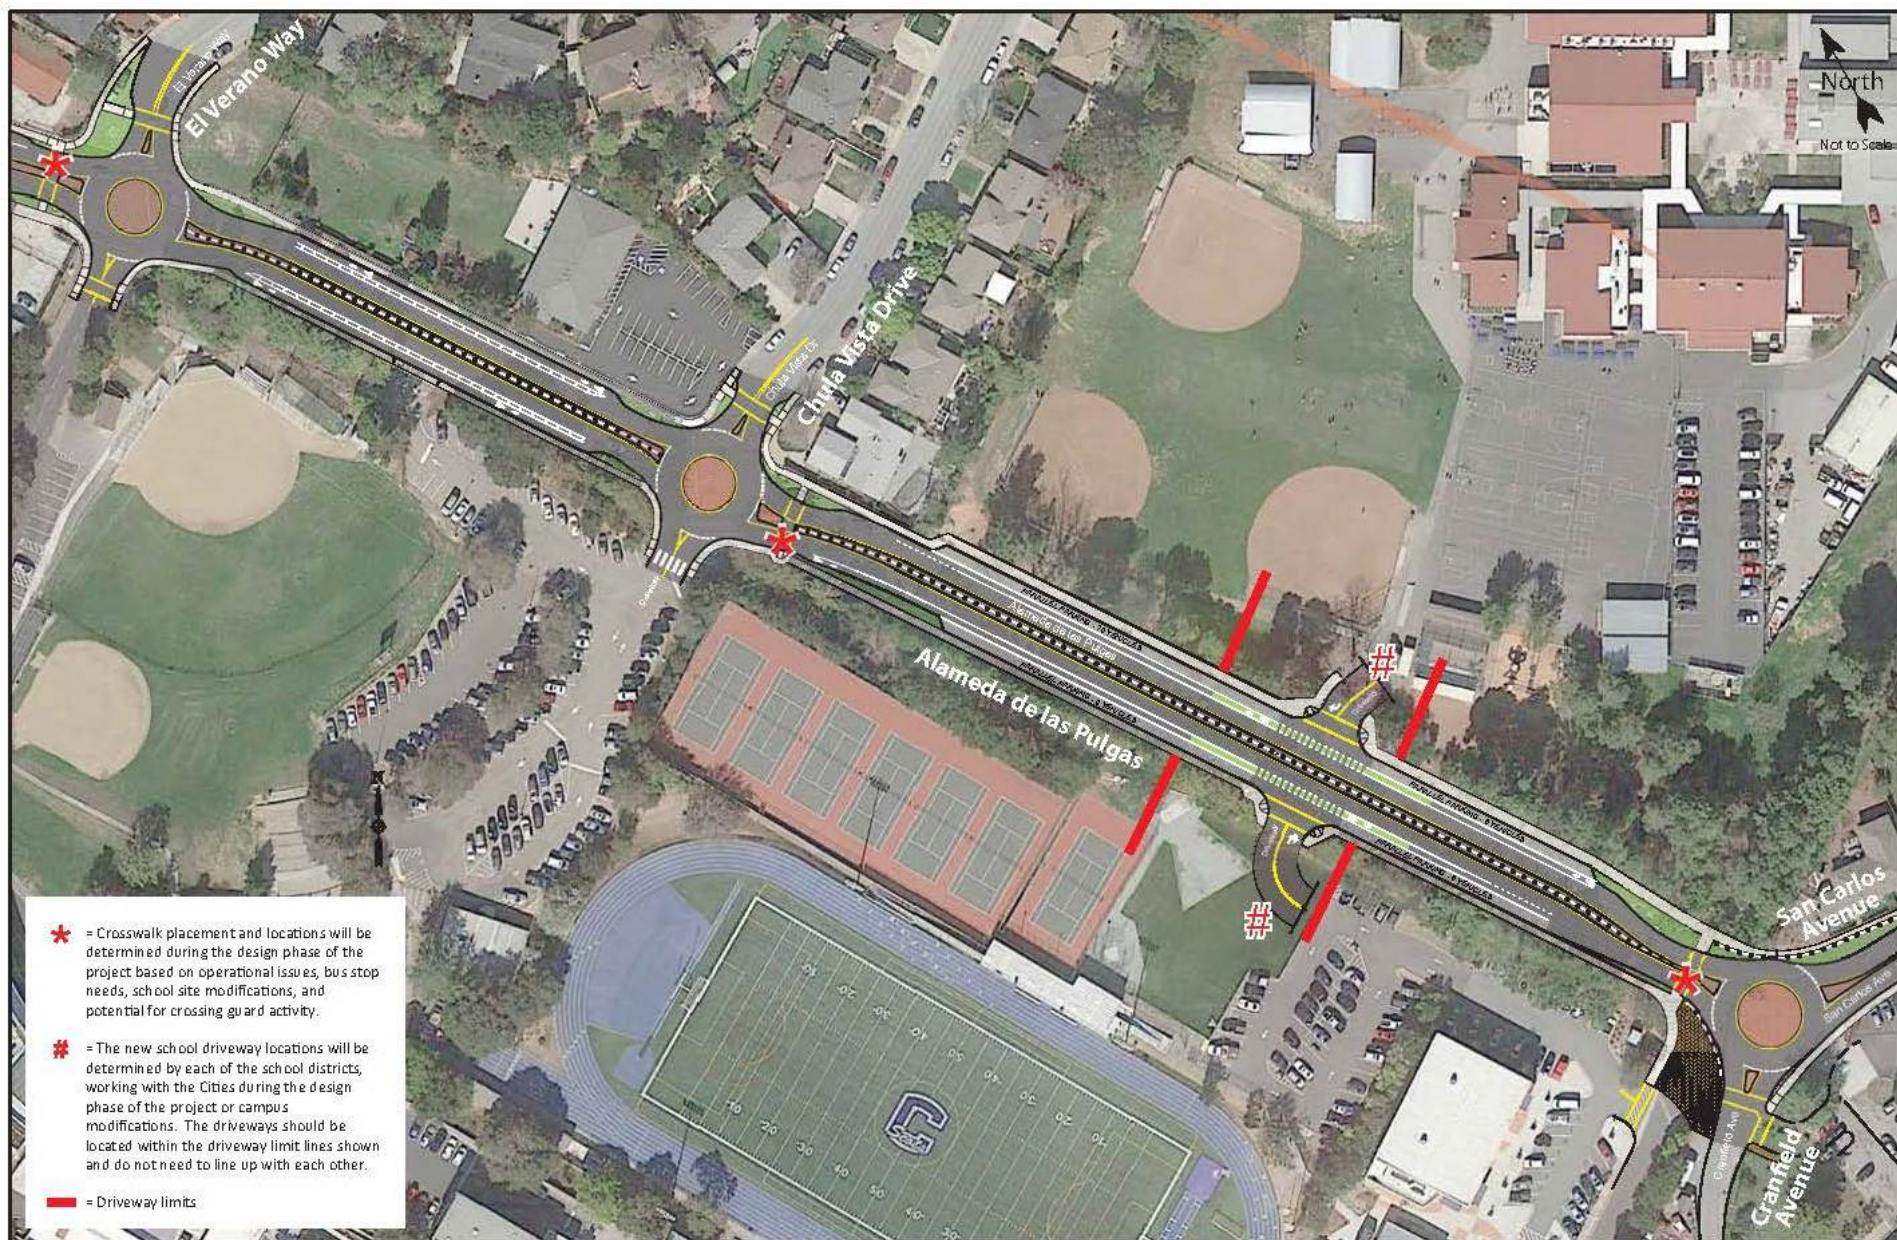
A - Alameda de las Pulgas/San Carlos Avenue Corridor Plan
